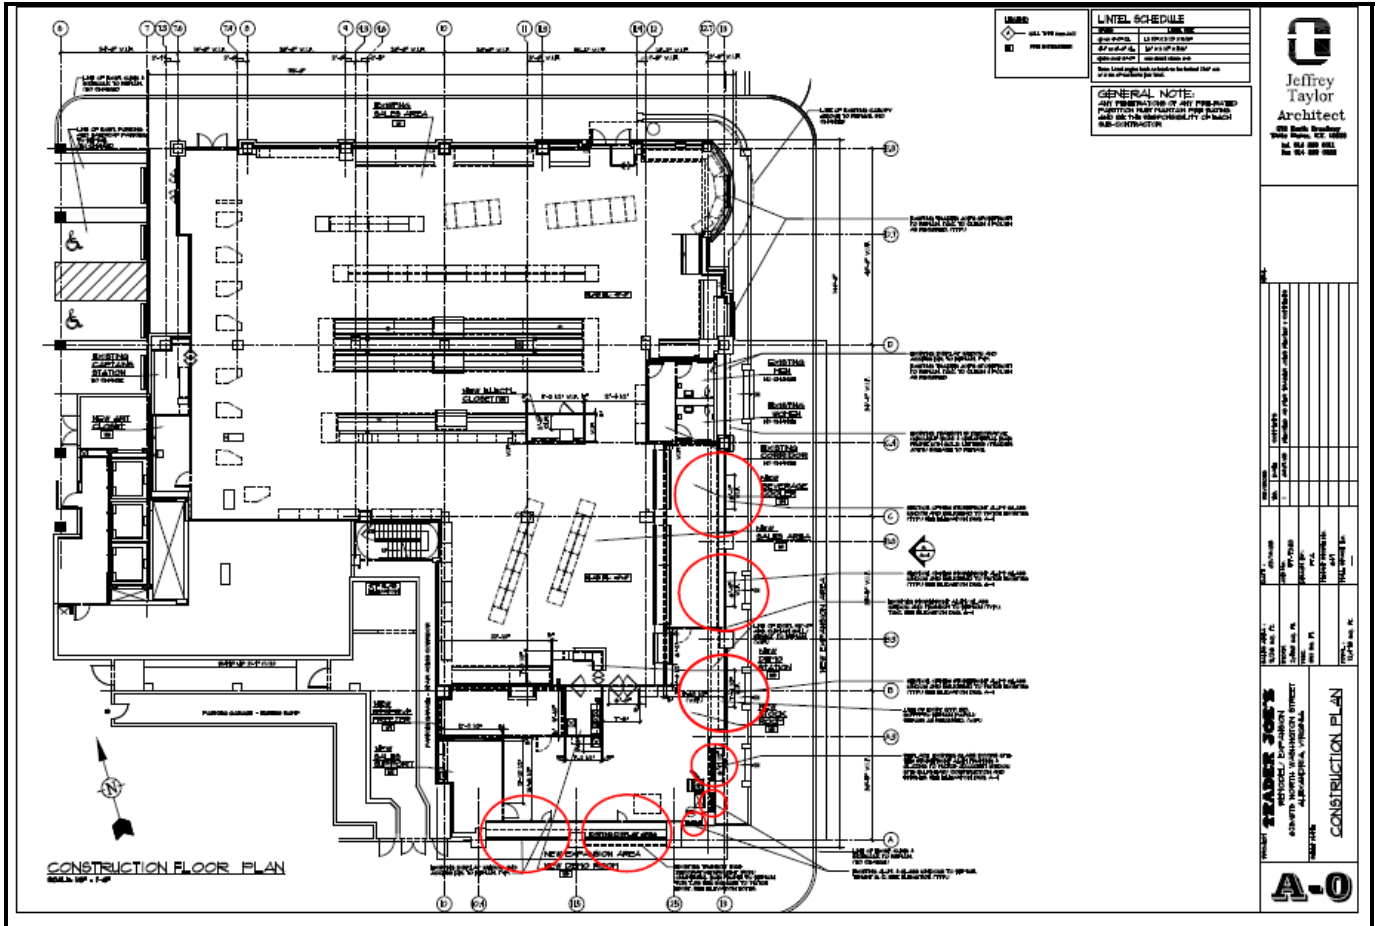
Original proposed floor plan from July 2008 showing windows (circled) proposed to be blocked for storage space
